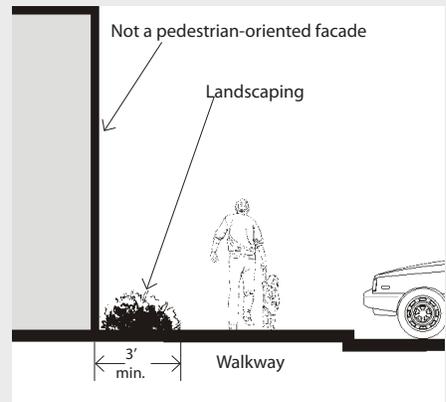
An example sketch of landscaping between buildings and walkways.
